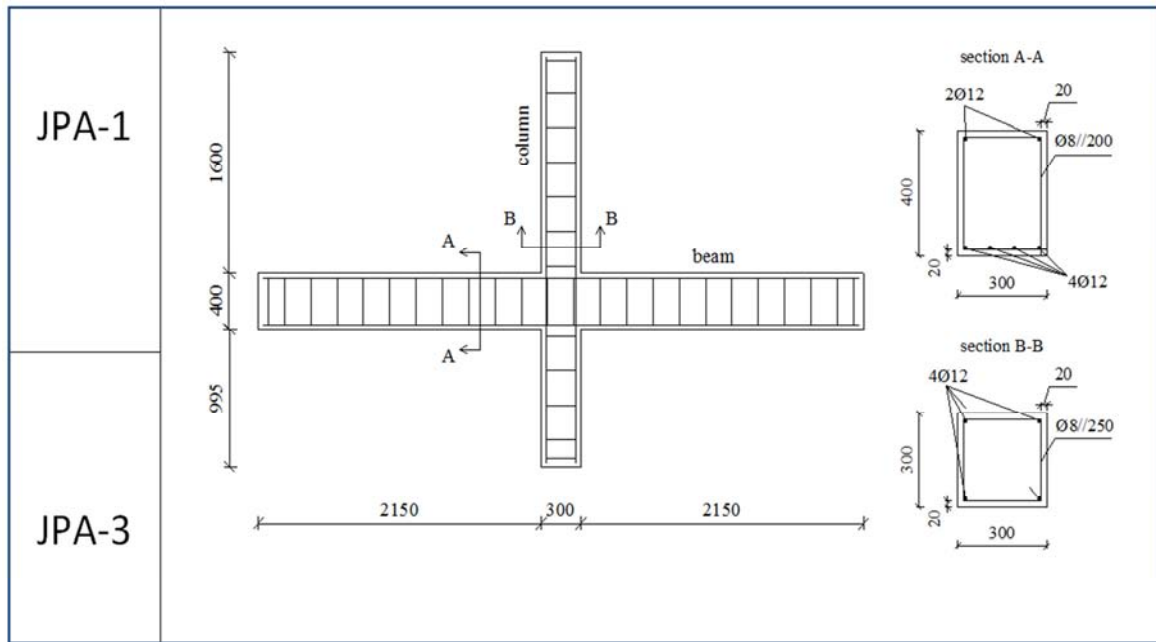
Geometry details in mm of specimens JPA-1 and JPA-3
